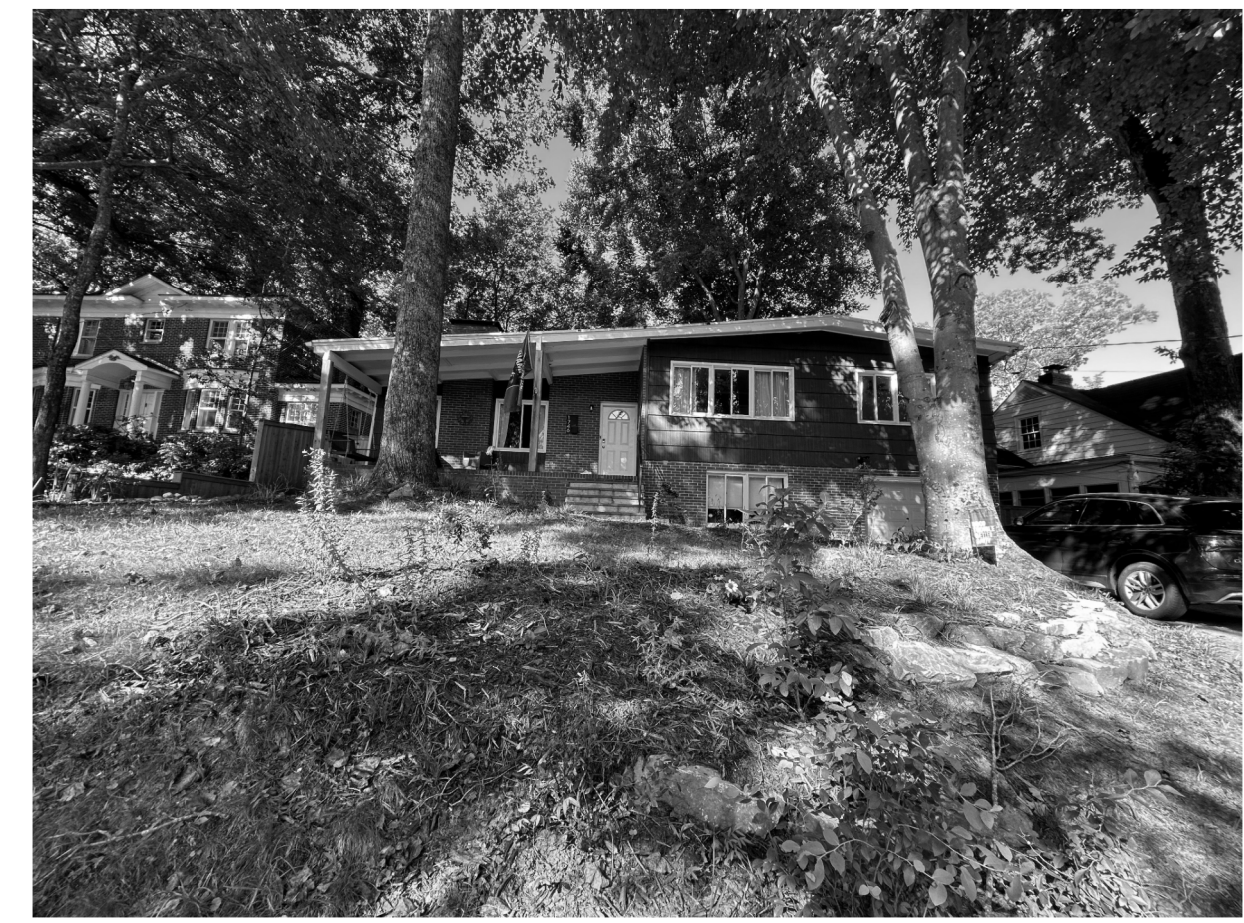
PHOTO OF THE STREET ELEVATION OF EXISTING RESIDENCE
